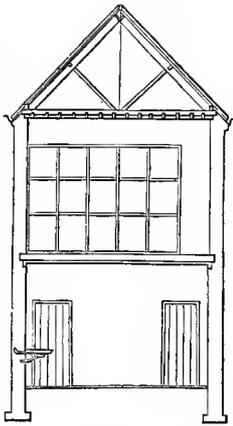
Vertical section of milk-house and cheese-room, figs. 706 and 707.
